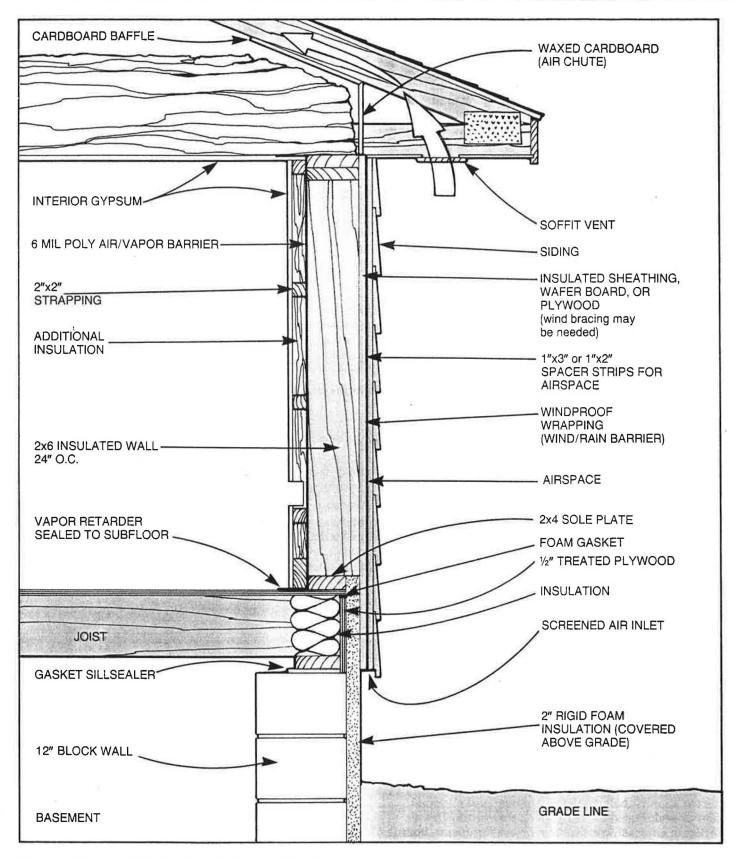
Generic wall design for cold climates using the Strapped 2x6 Approach (new construction).
